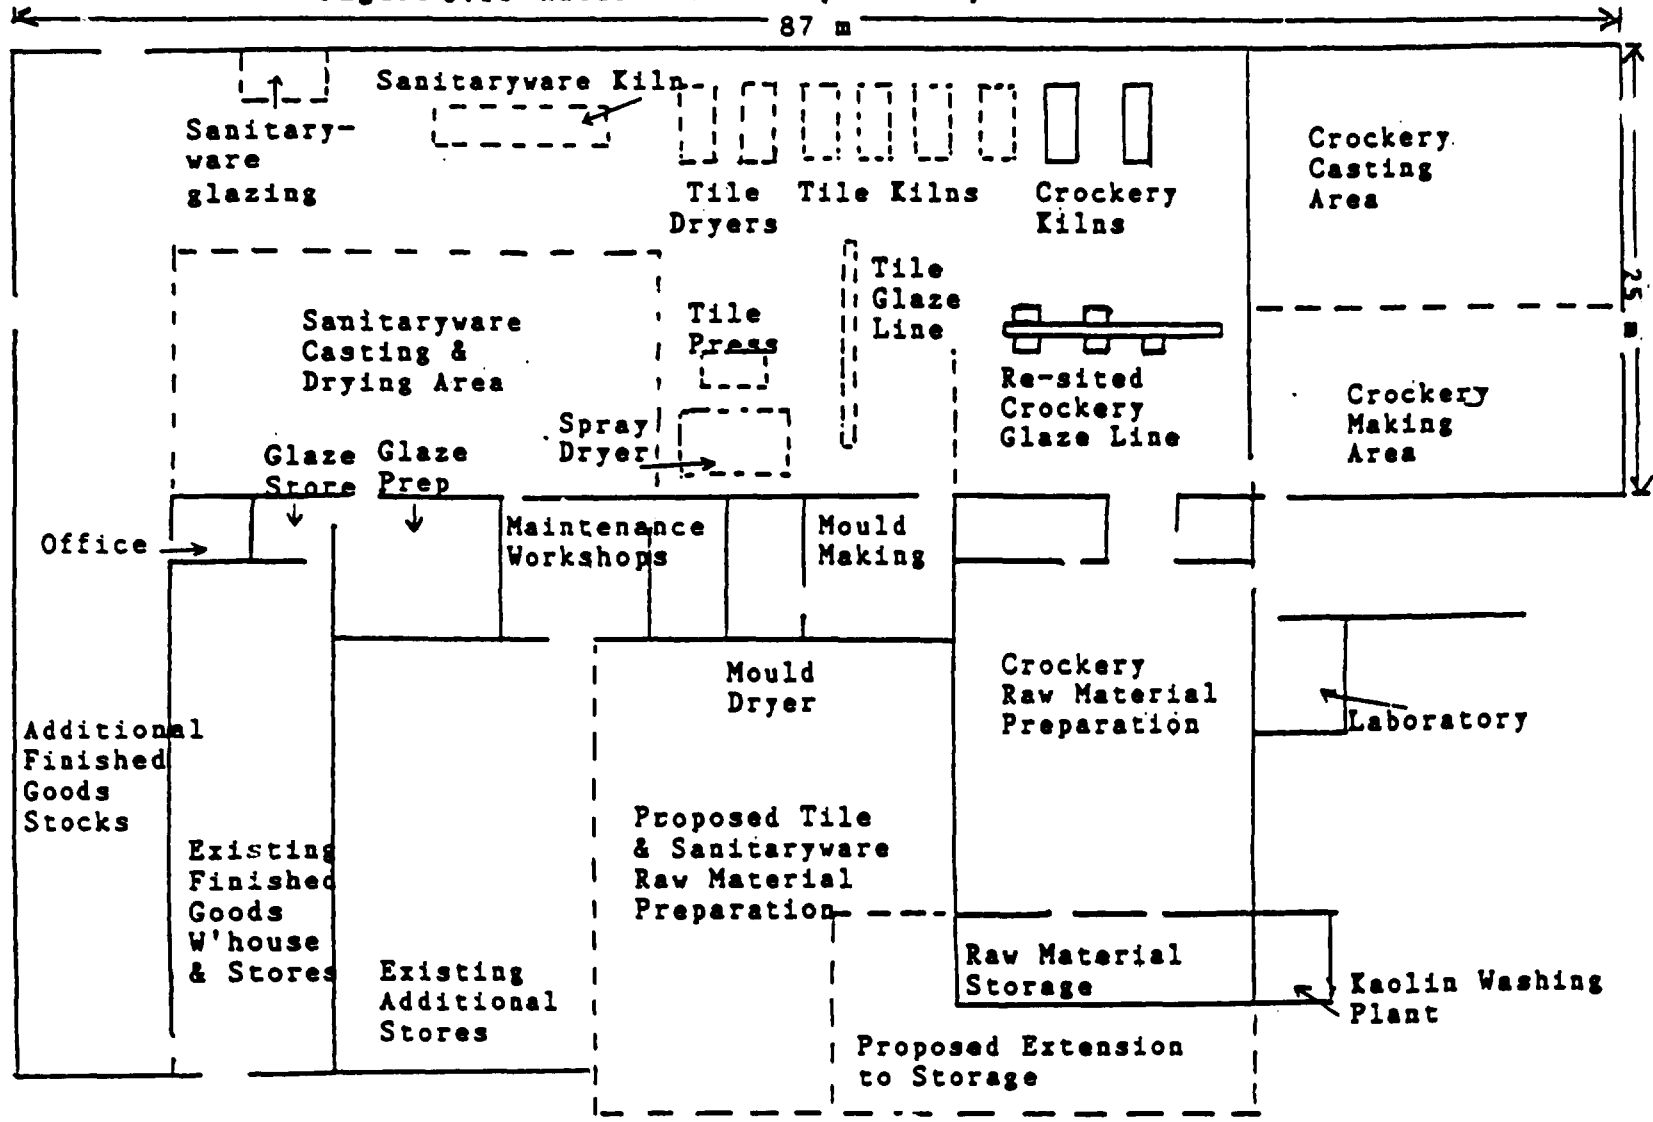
Alternative Proposed Layout at African Ceramics Site
